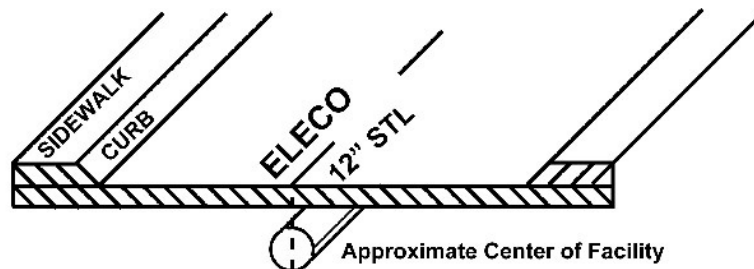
Single Facility Marking Over the Approximate Center of the Facility
